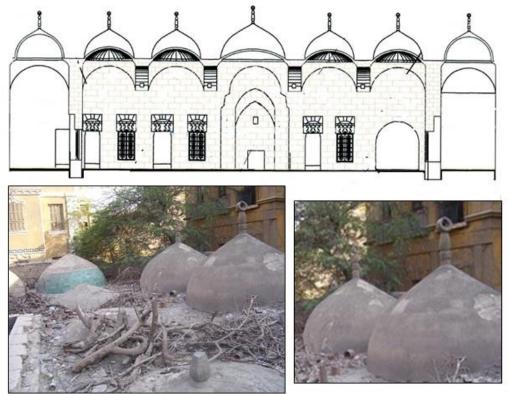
ground floor doomed roof (semi-circle and inclined dooms
